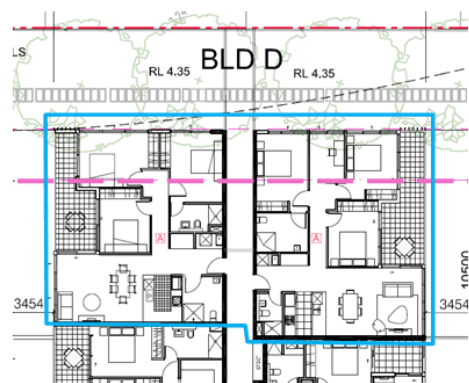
Approved floor plan layouts of the affected units on Ground Level in Building D (setback required to pink line)
